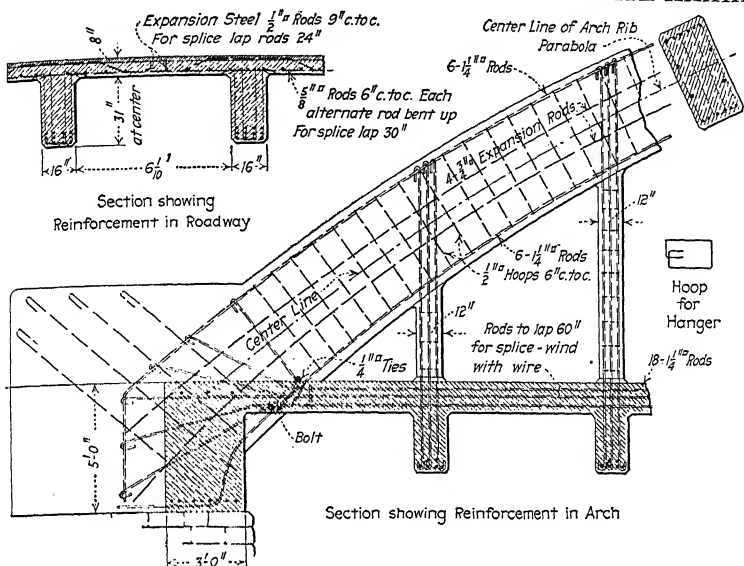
Benson Street bridge over Mill Creek at Lockland, Ohio.
